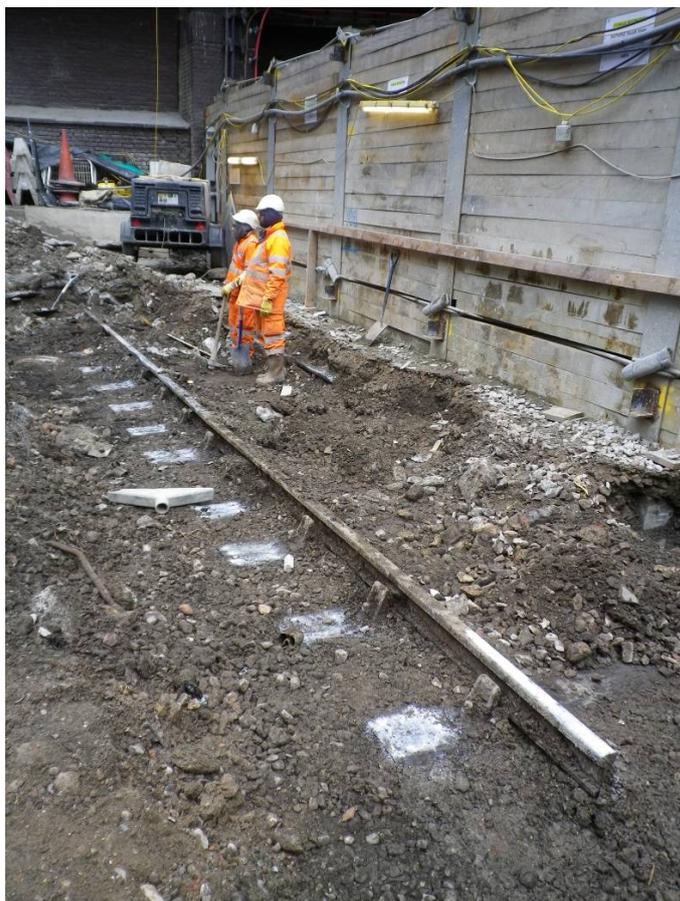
Railway track exposed at the northern edge of the Blomfield Street site, looking west
